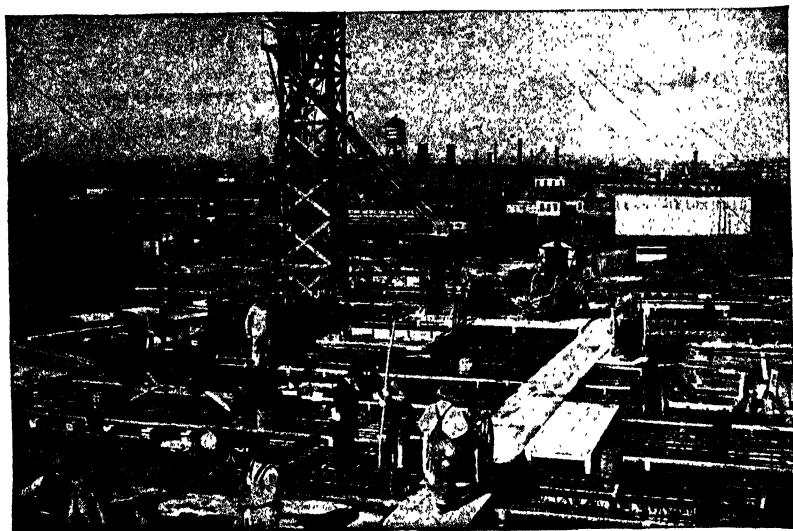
Chuting Concrete—Massachusetts Institute of Technology Buildings
